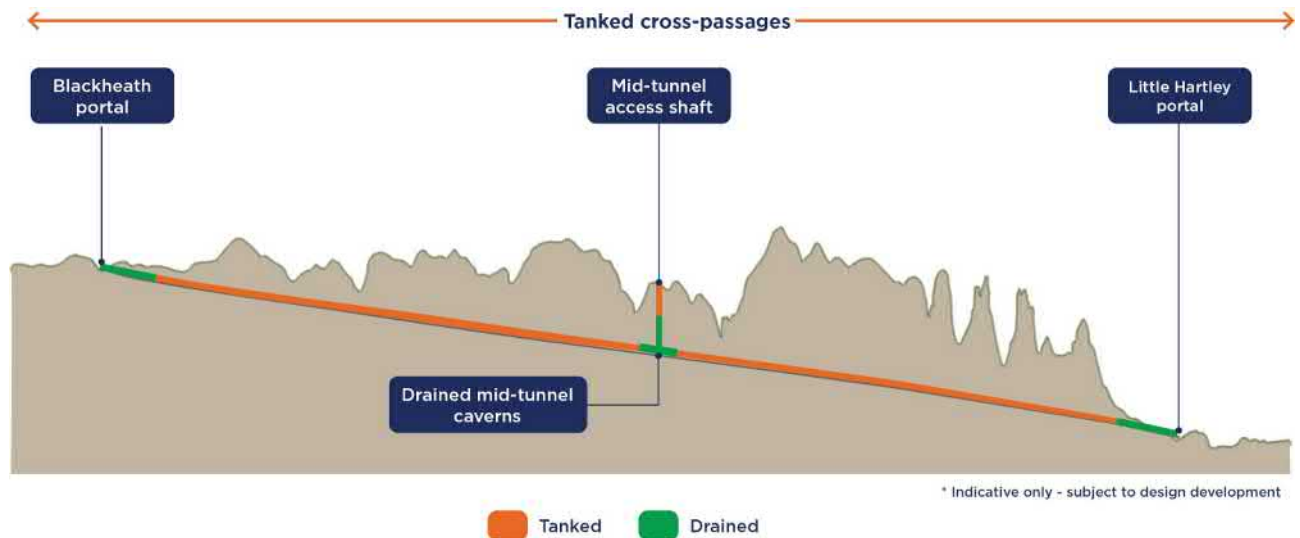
Tanked and drained sections of the tunnel and mid-tunnel access shaft
